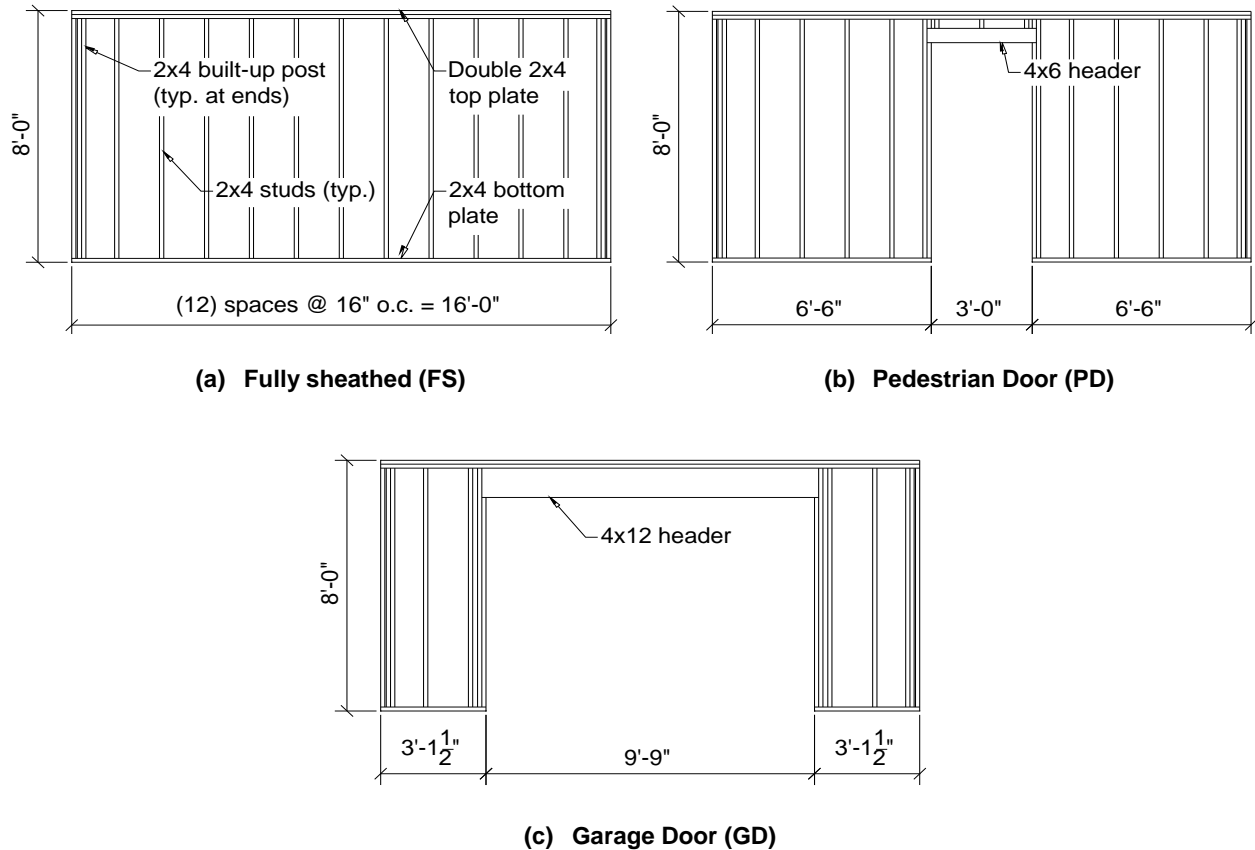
CUREE-Caltech Woodframe Project wall framing configurations, after [7]
